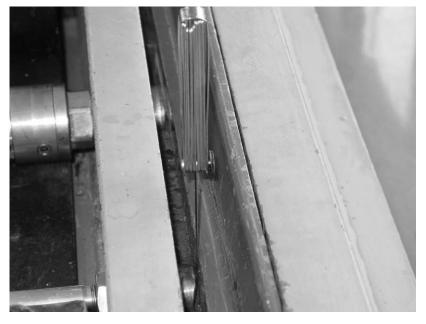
Measure the dimension between the attachment gap and the point tongue
